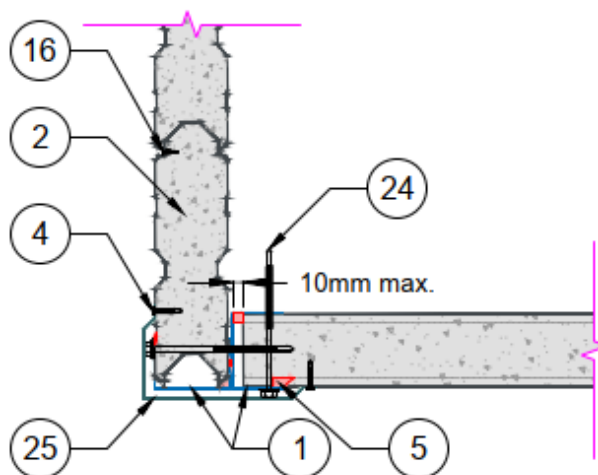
Vertical or horizontal Speedpanel wall under stair stringer (section view)
